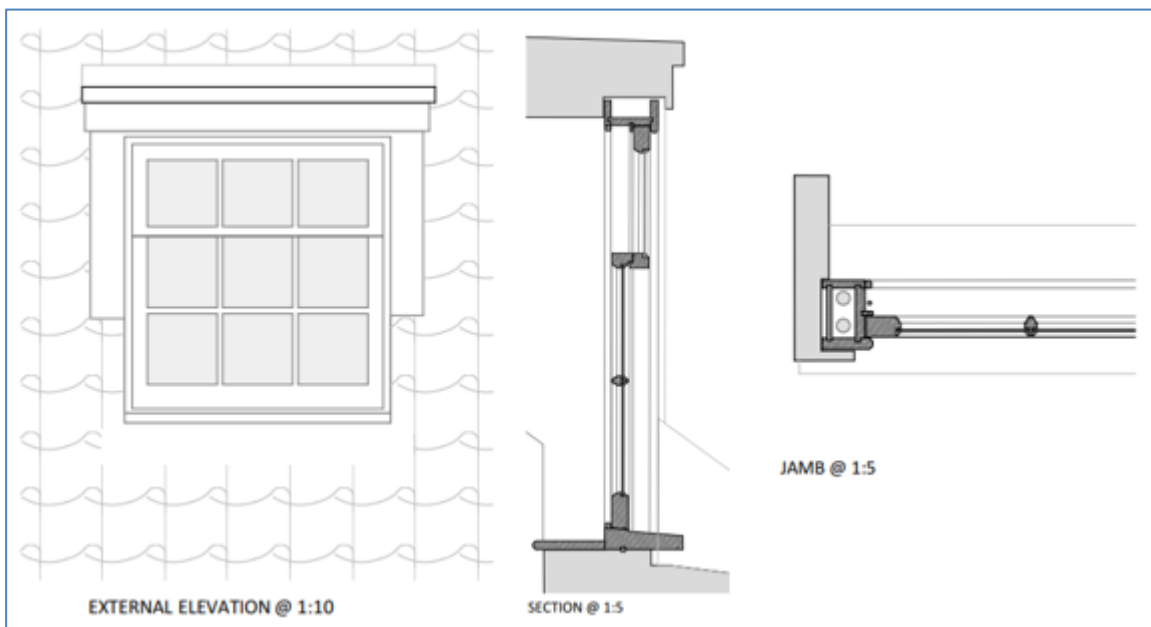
Extract from plans showing details of Dormer Window (FW4)
